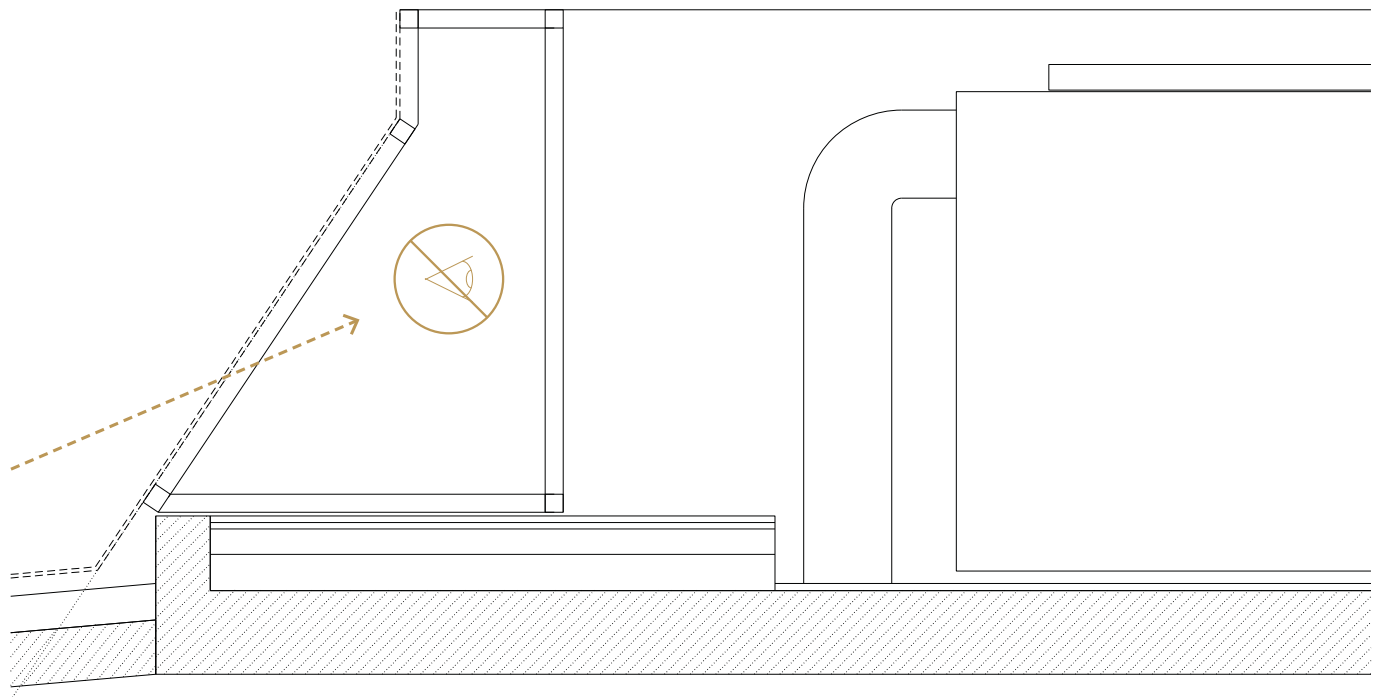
Overrunning Facade - the overrunning facade will act as a visual barrier and conceal any plant equipment behind it.
